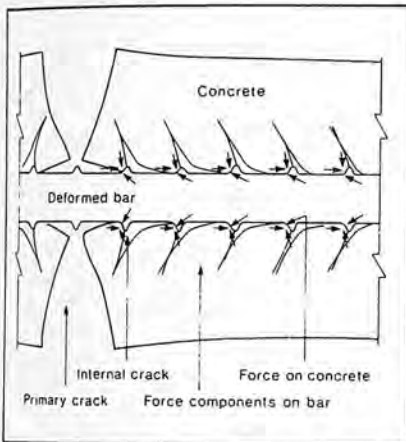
Schematic diagram of conditions close to a deformed reinforcing bar.
